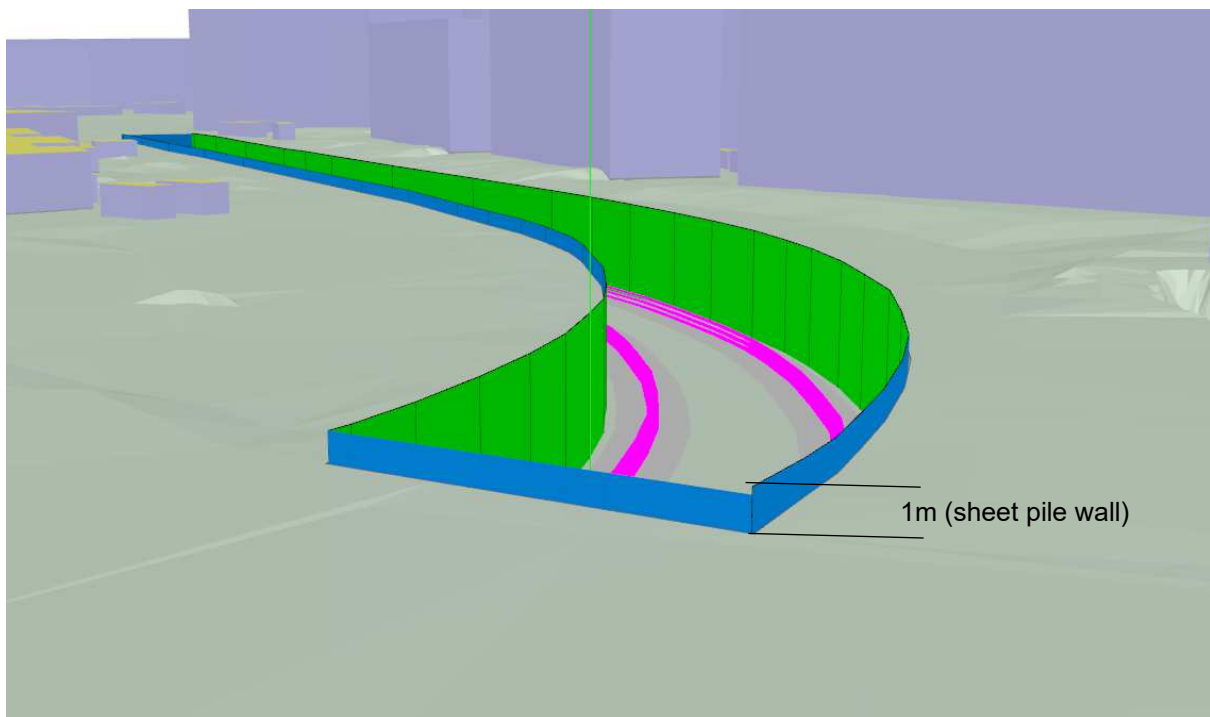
Scenario 1. Sketch of sound-absorbing elements (green shading) installed on the inner side of the sheet-pile walls of the railway cutting, covering the full height from the tracks to the top of the walls.
